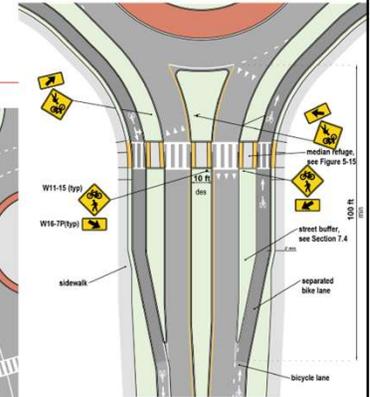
Typical Layout of Separated Bike Lanes at Roundabout
